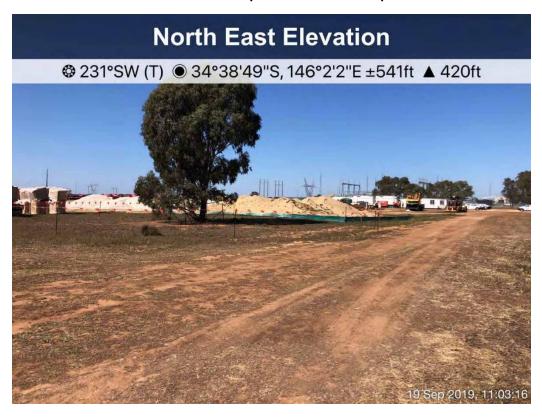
Waste pile bound at point of install ('Golden Row'), to minimise loose waste movement
